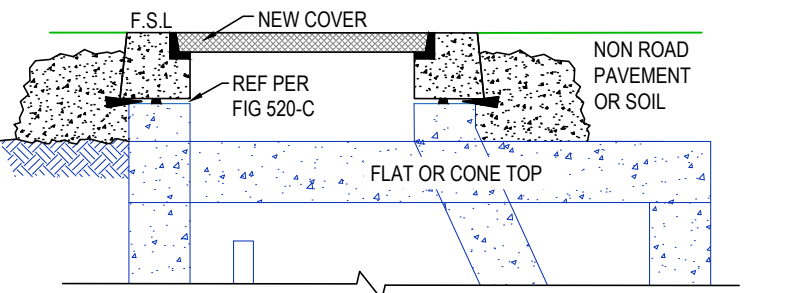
E: LOWERED MH NECK OUT OF ROAD PAVEMENT
